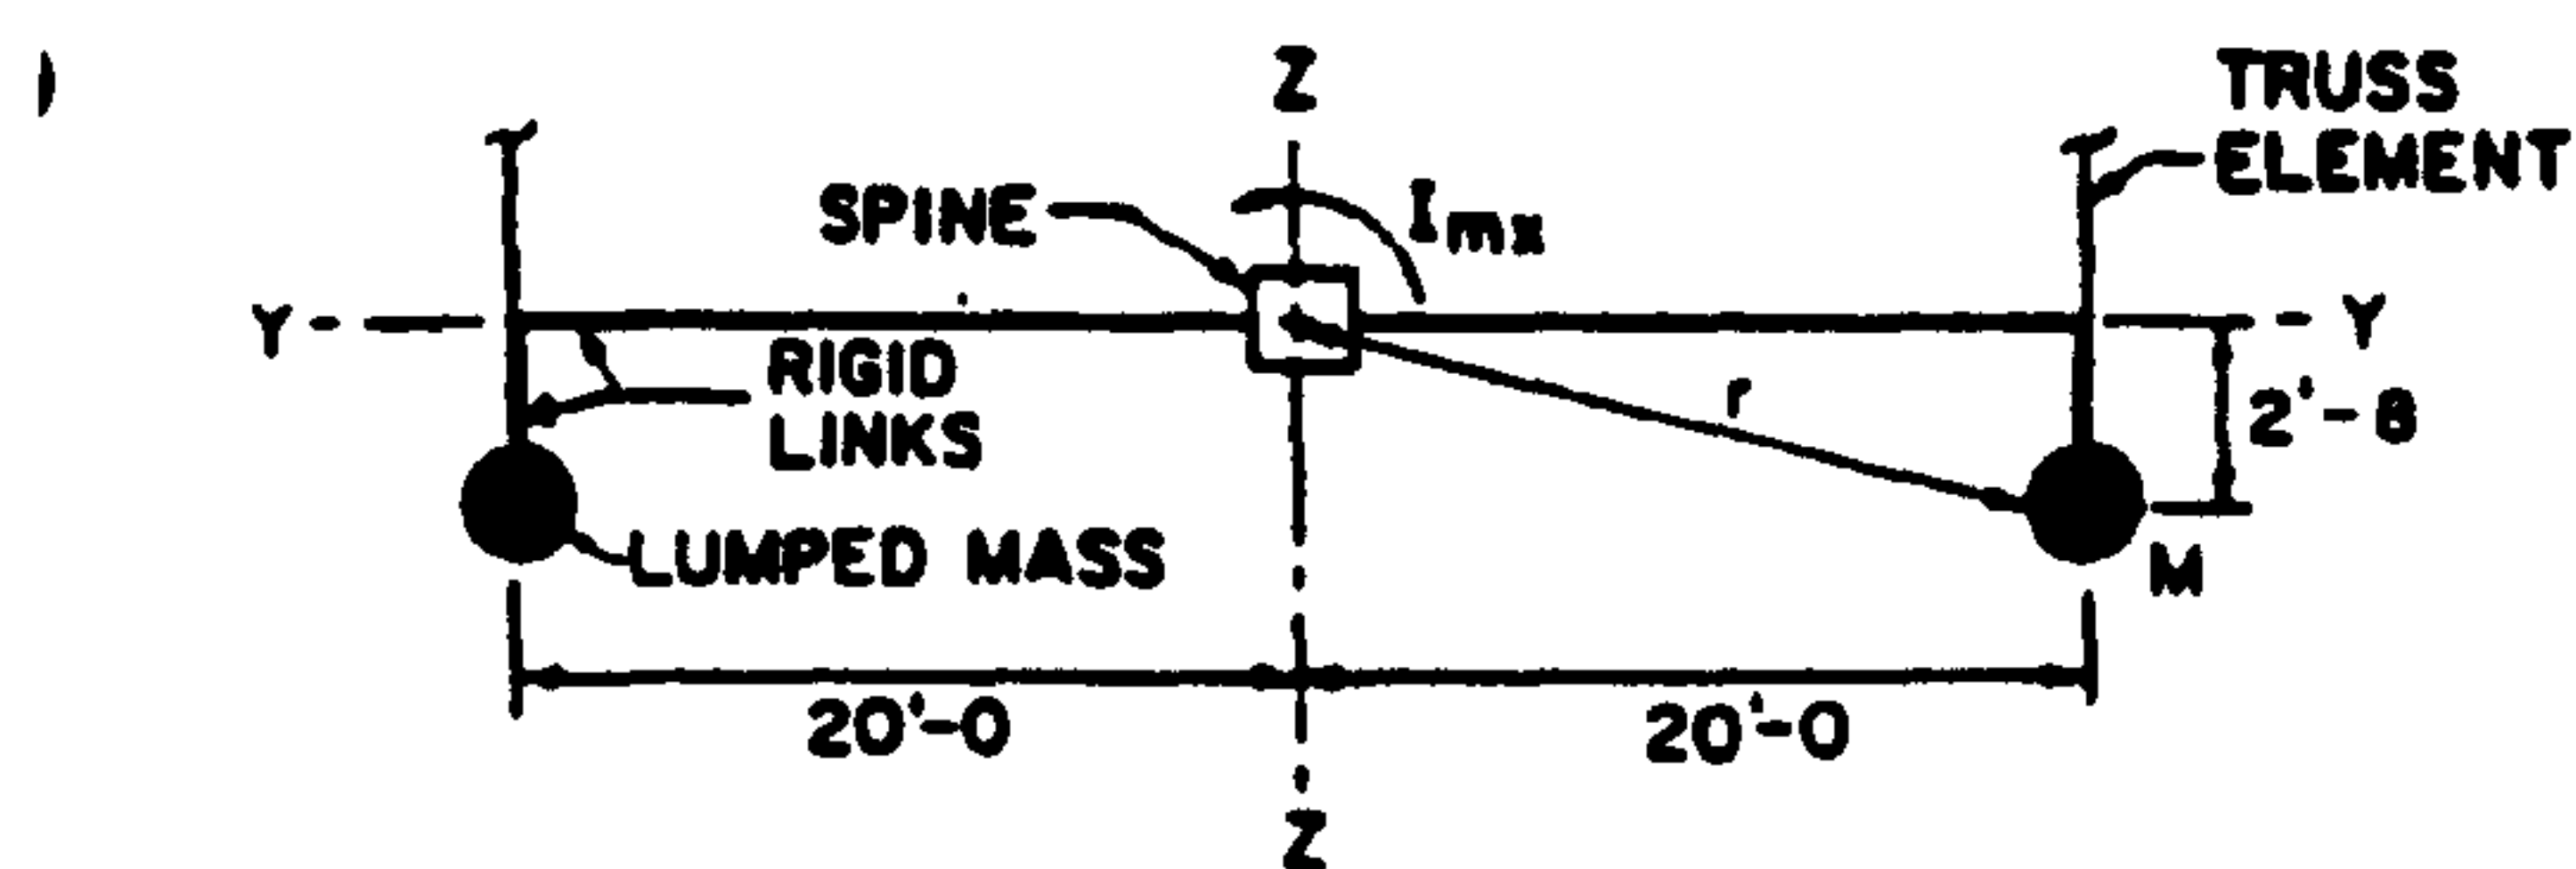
Modelling of Deck Section of Quincy Bayview Bridge (Wilson & Gravelle 1991)
